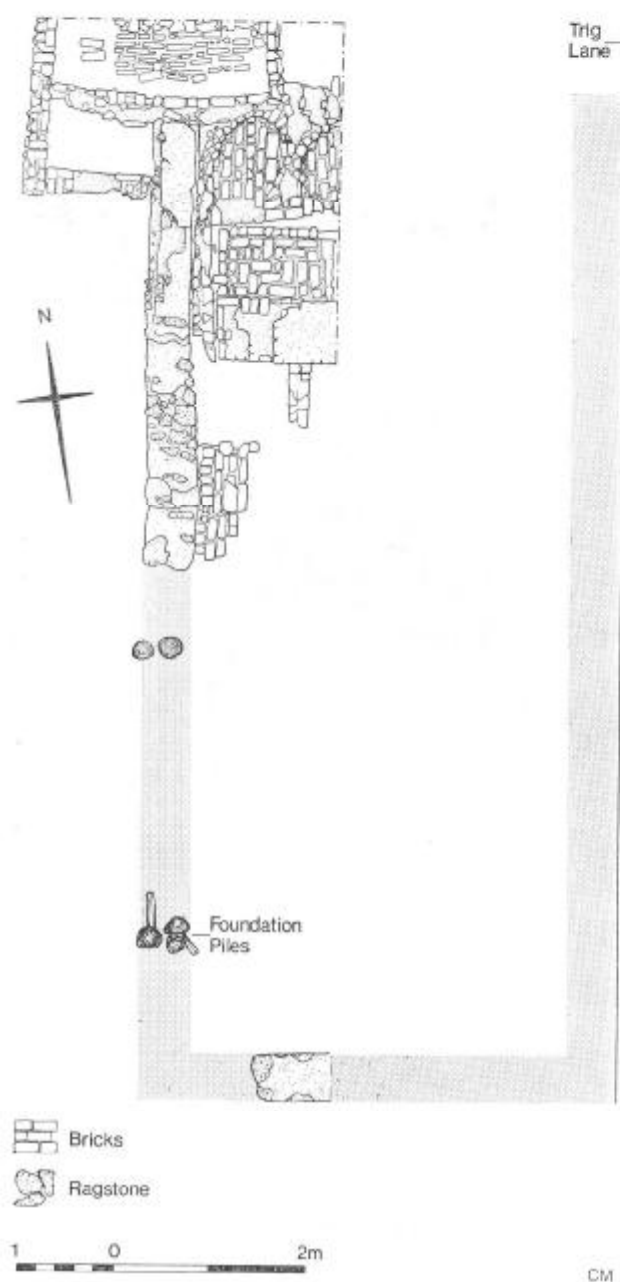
Plan of Building E situated c 10m north of Period VI river wall (see Fig. 1).
